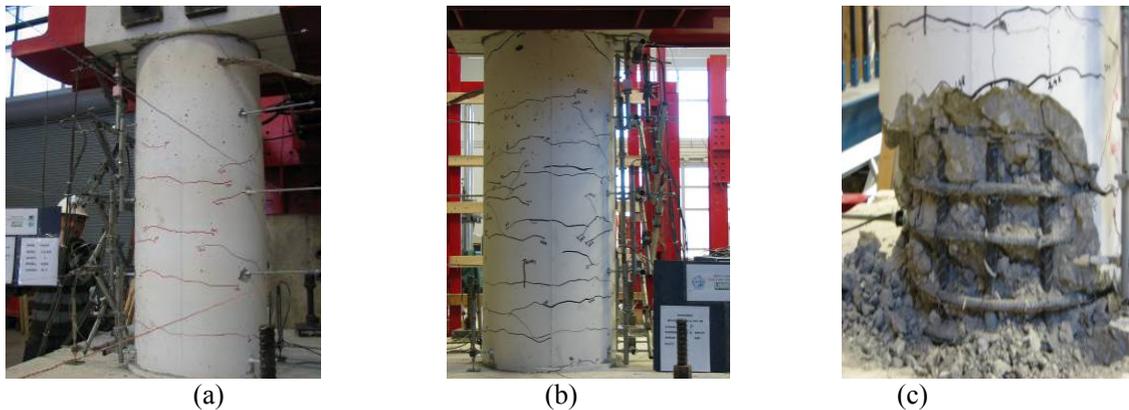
Damage of column under bending-shear at (a) cracking, (b) first longitudinal bar yielding, and (c) overall failure
